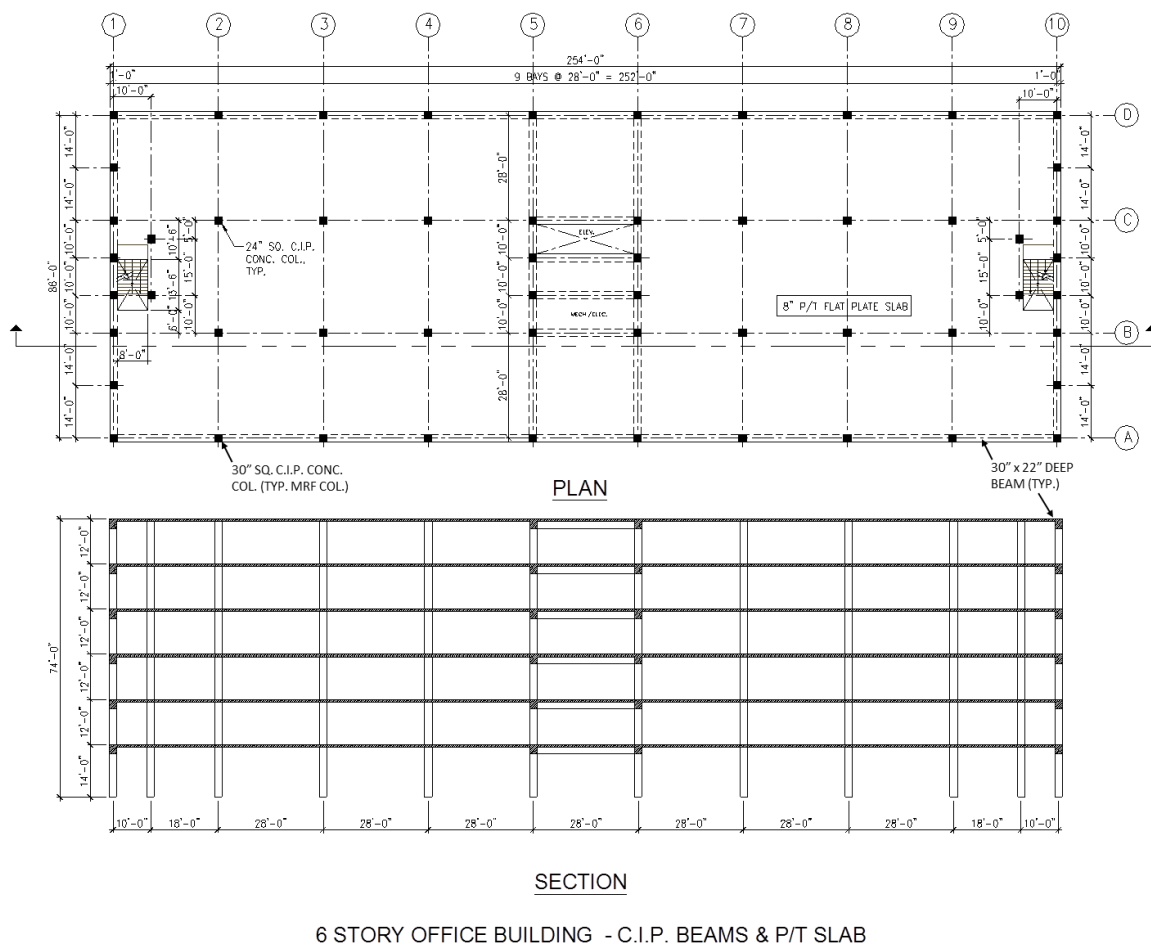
Prototype 6-Story Reinforced Concrete SMRF Office Building for Hilo, HI, Monterey, CA, and Seaside, OR - Plan and Section Views (The Waikīkī, HI, building has intermediate moment resisting frames at the same locations)
